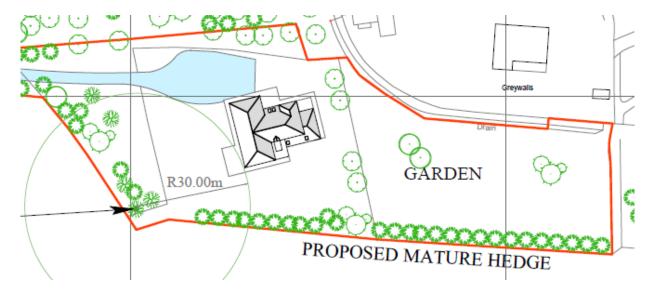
Extract from AH129-PP01 Site Location Plan (Source: Aidan Hume Design).
